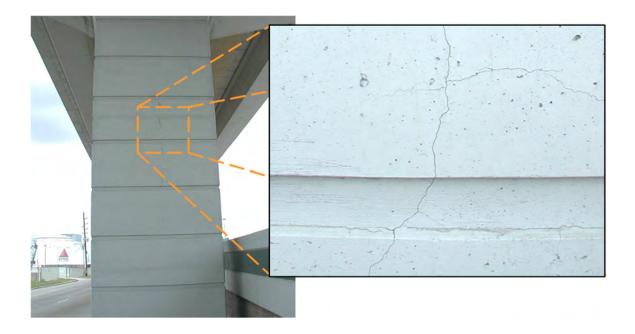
Thermal cracking of a bridge column in Texas (Photo Courtesy of Dr. J.C. Liu)
